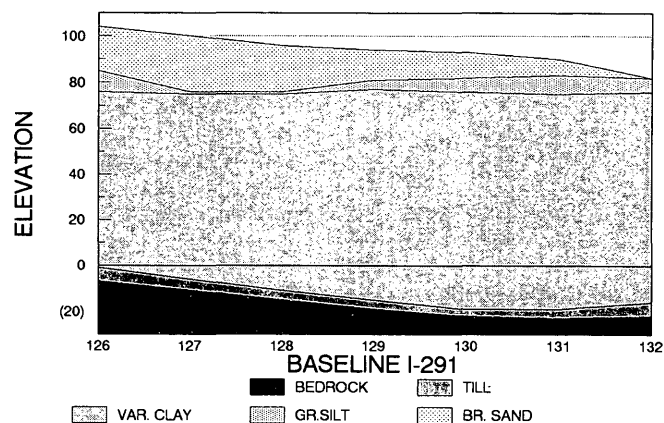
Soil profile, I-291, Windsor, Connecticut.
